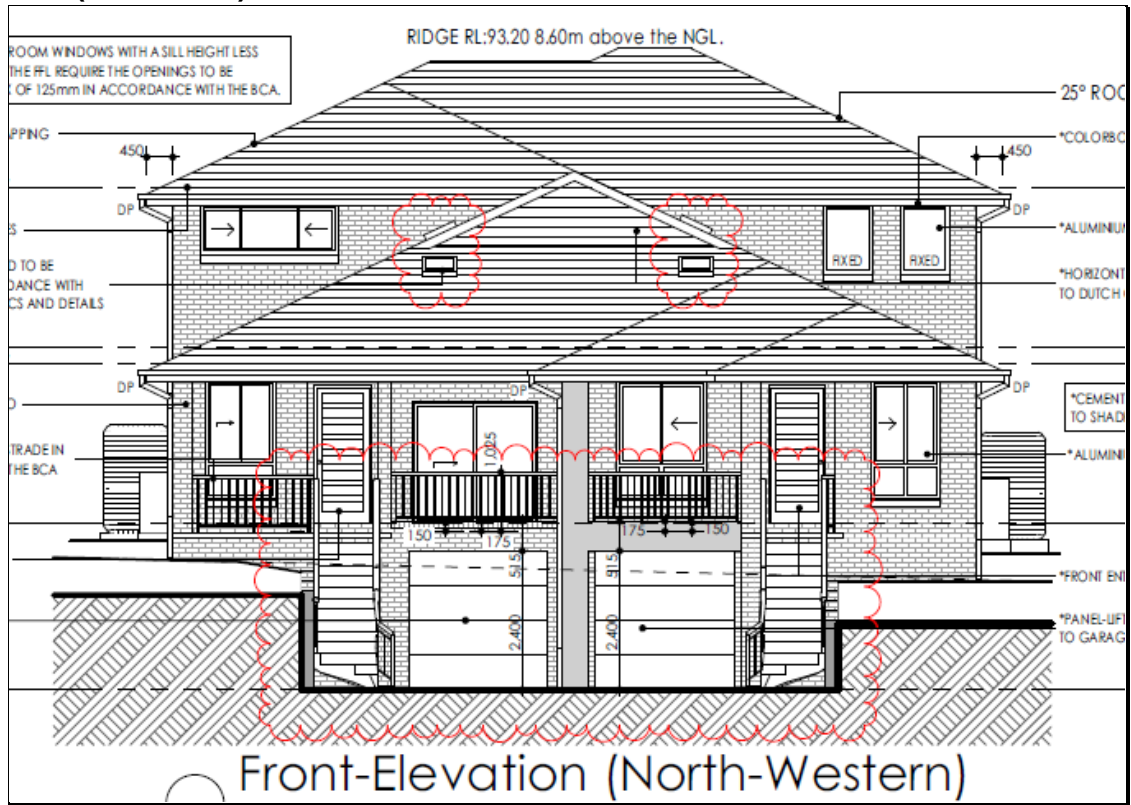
Proposed north-western elevation presenting to Mawarra Crescent
